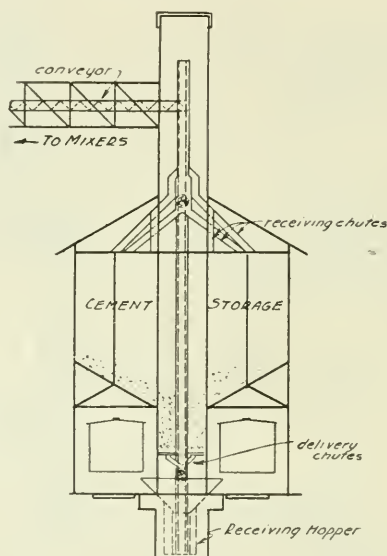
Cross Section Diagram Illustrating Plant Layout
